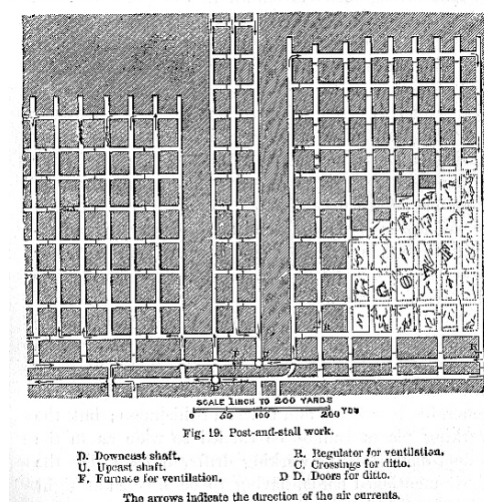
Sort wall, or pillar and stall method of working (10)
